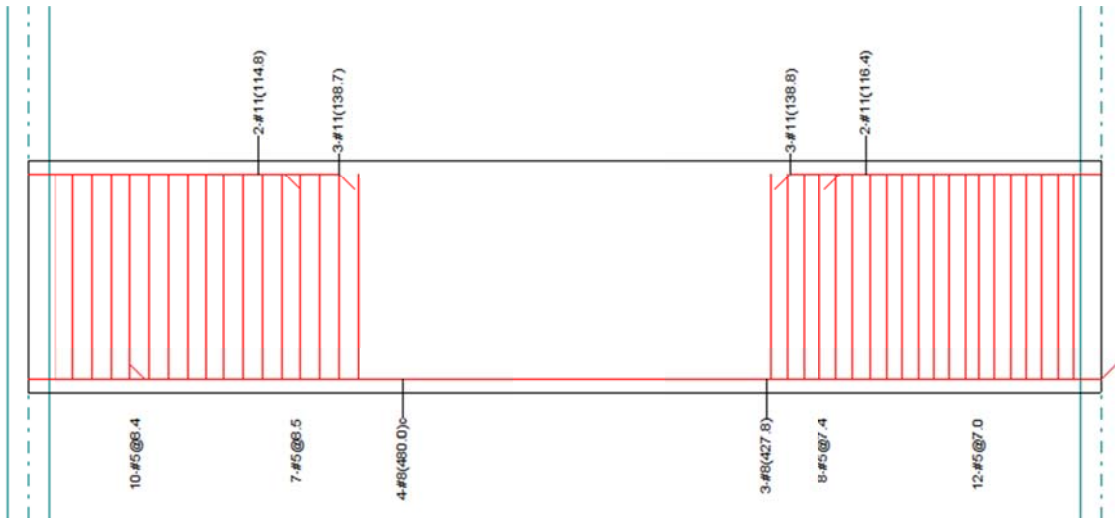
spBeam Transfer Girder 1 & 2 Reinforcing Diagram
